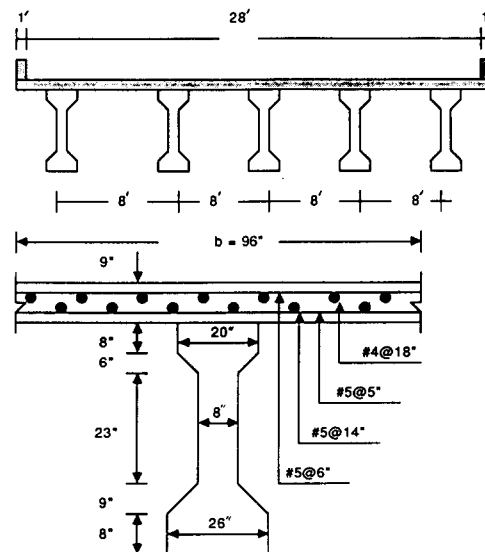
Prestressed concrete girder bridge considered in the analysis. Units: 1 in. = 25 mm; 1 ft = 305 mm.
